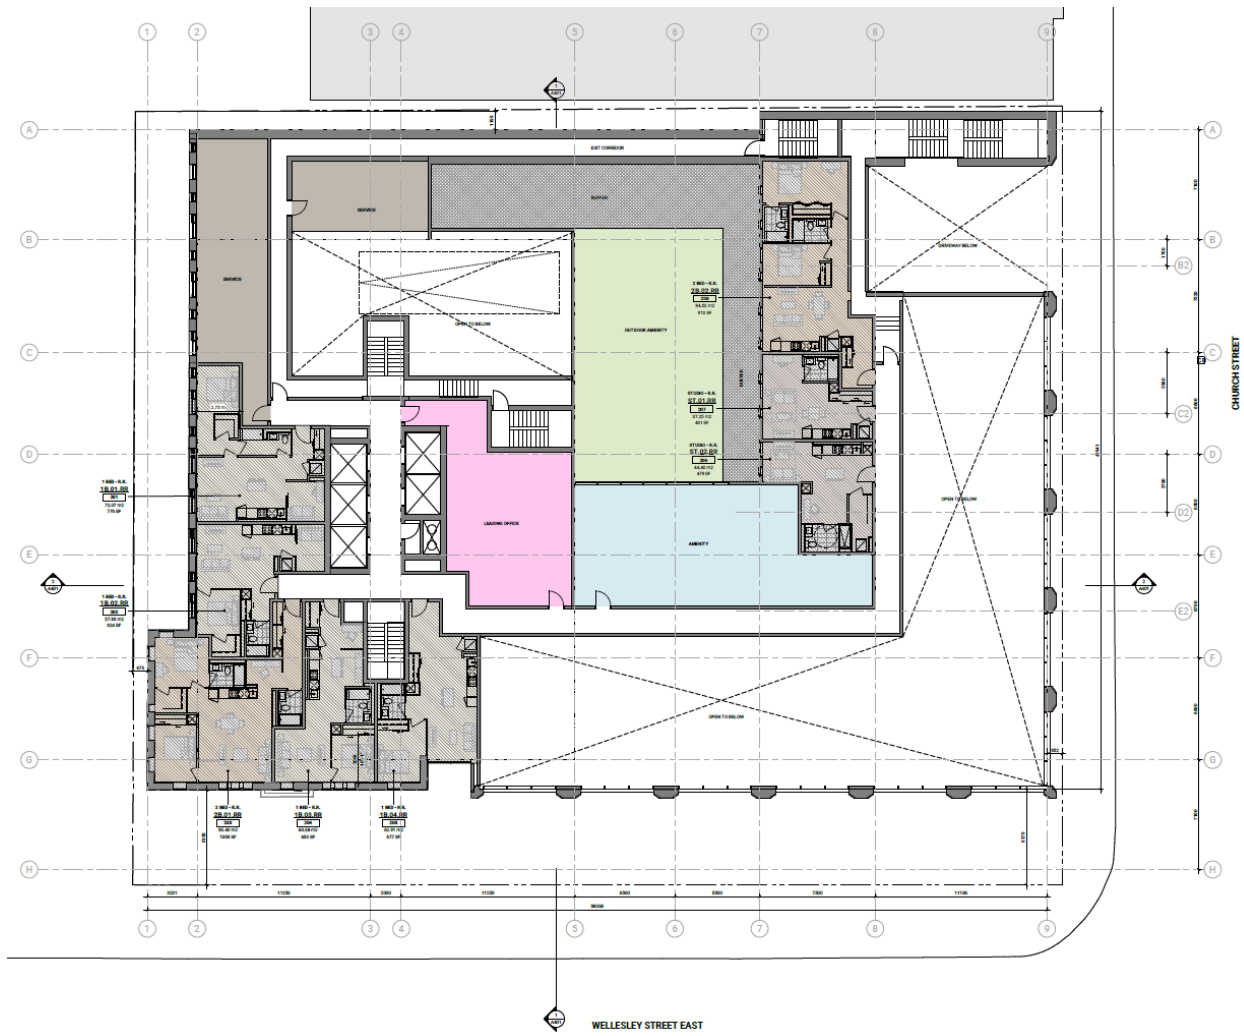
Level 2 floor plan for 64 Wellesley Street East included for illustration purposes (ERA Architects Inc., March 3, 2026).
